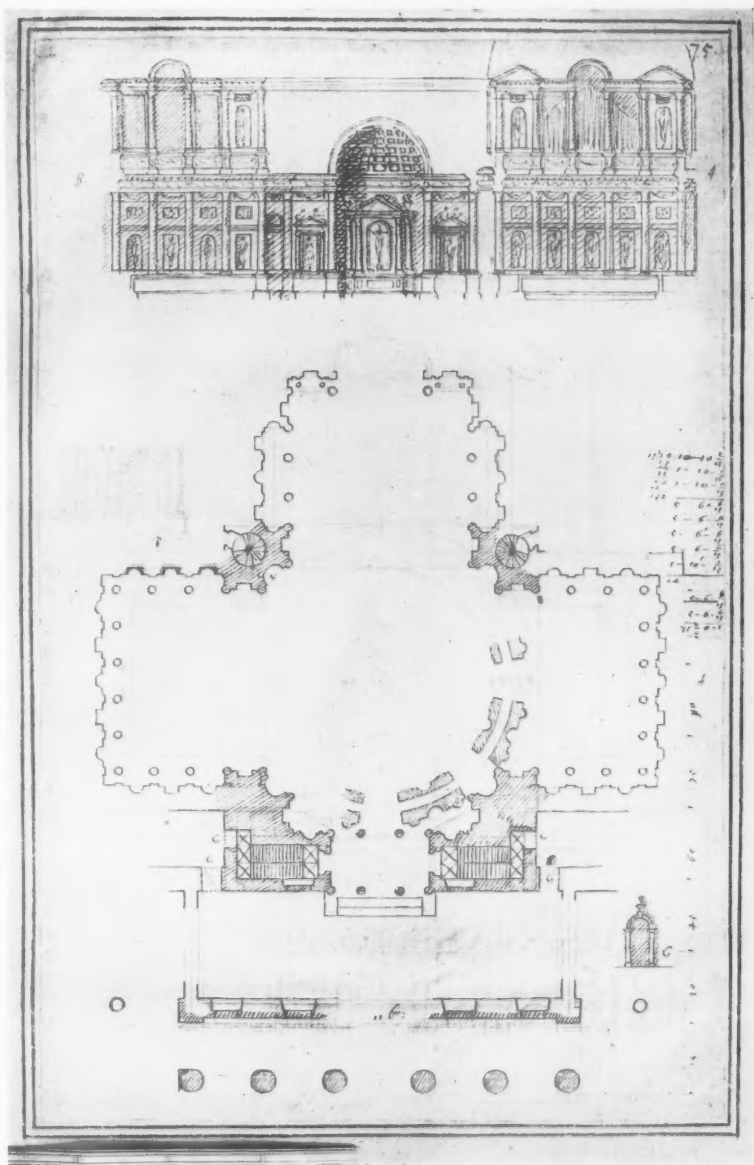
PLAN AND SECTION OF THE CHAPEL OR HALL ON THE PLAN SHOWN IN FIG. 28 (ON THE LOWER SIDE OF THE CENTRAL COURT) BY WEBB
